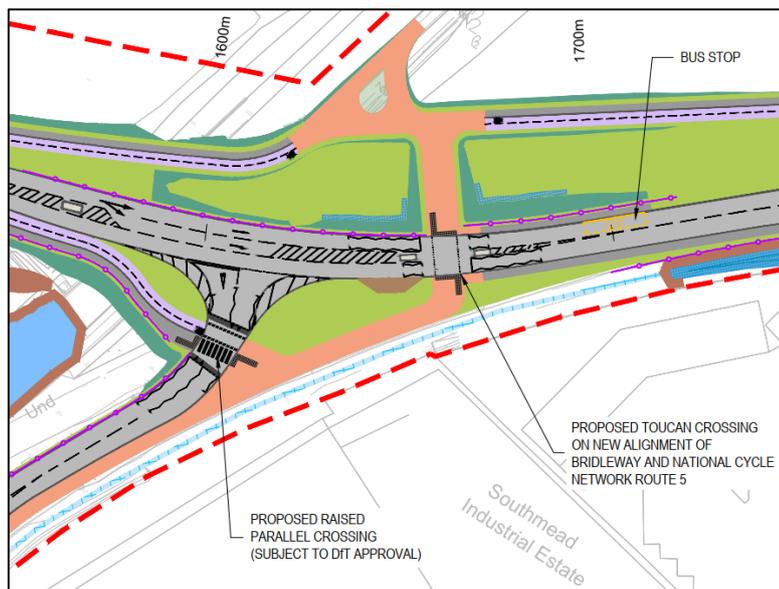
Proposed Old A4130 Priority Junction north of Purchas Road/Hawksworth Roundabout
